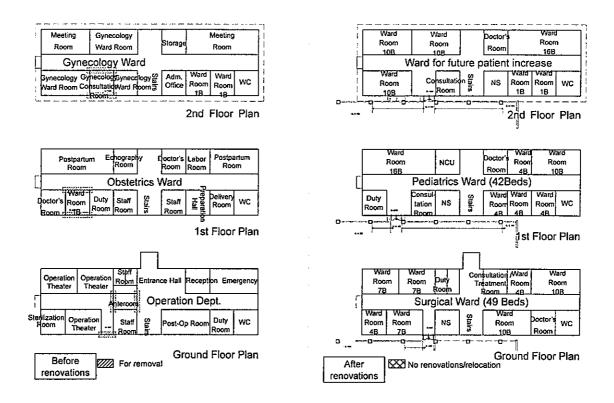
Post-Project Renovation and Relocation Plan for Existing Building C
